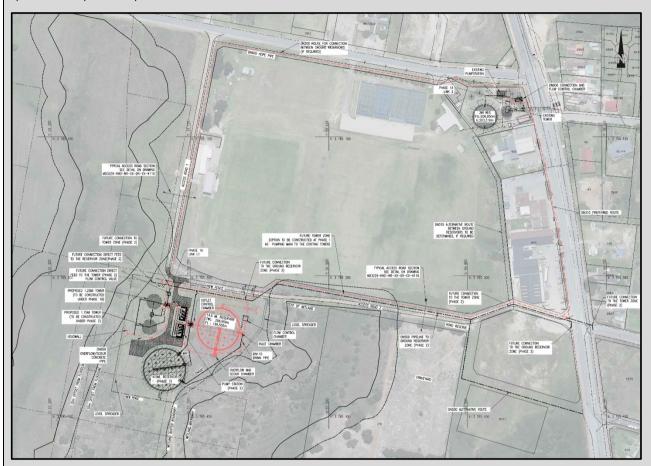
Proposed site development plan of preferred alternative (RoyalHaskoningDHV, 2023).
